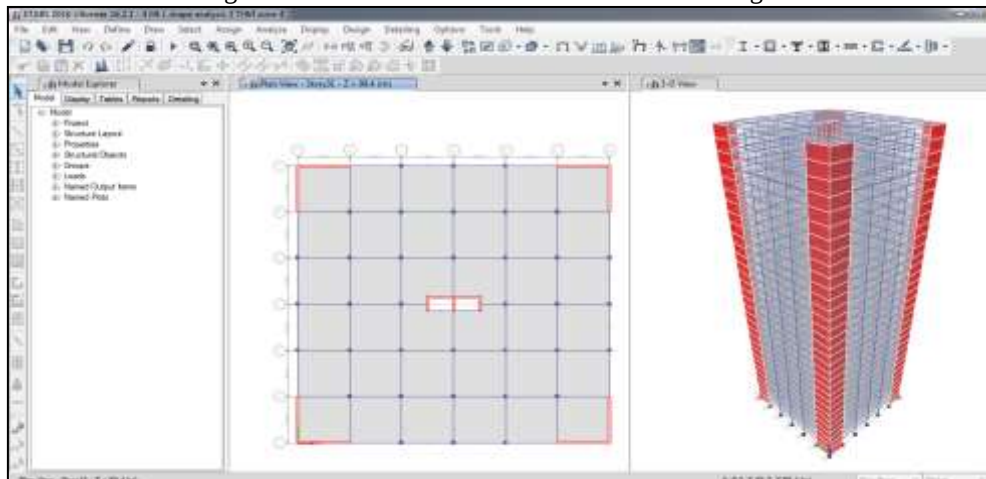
Plan & 3D view Of the structure with shear walls
